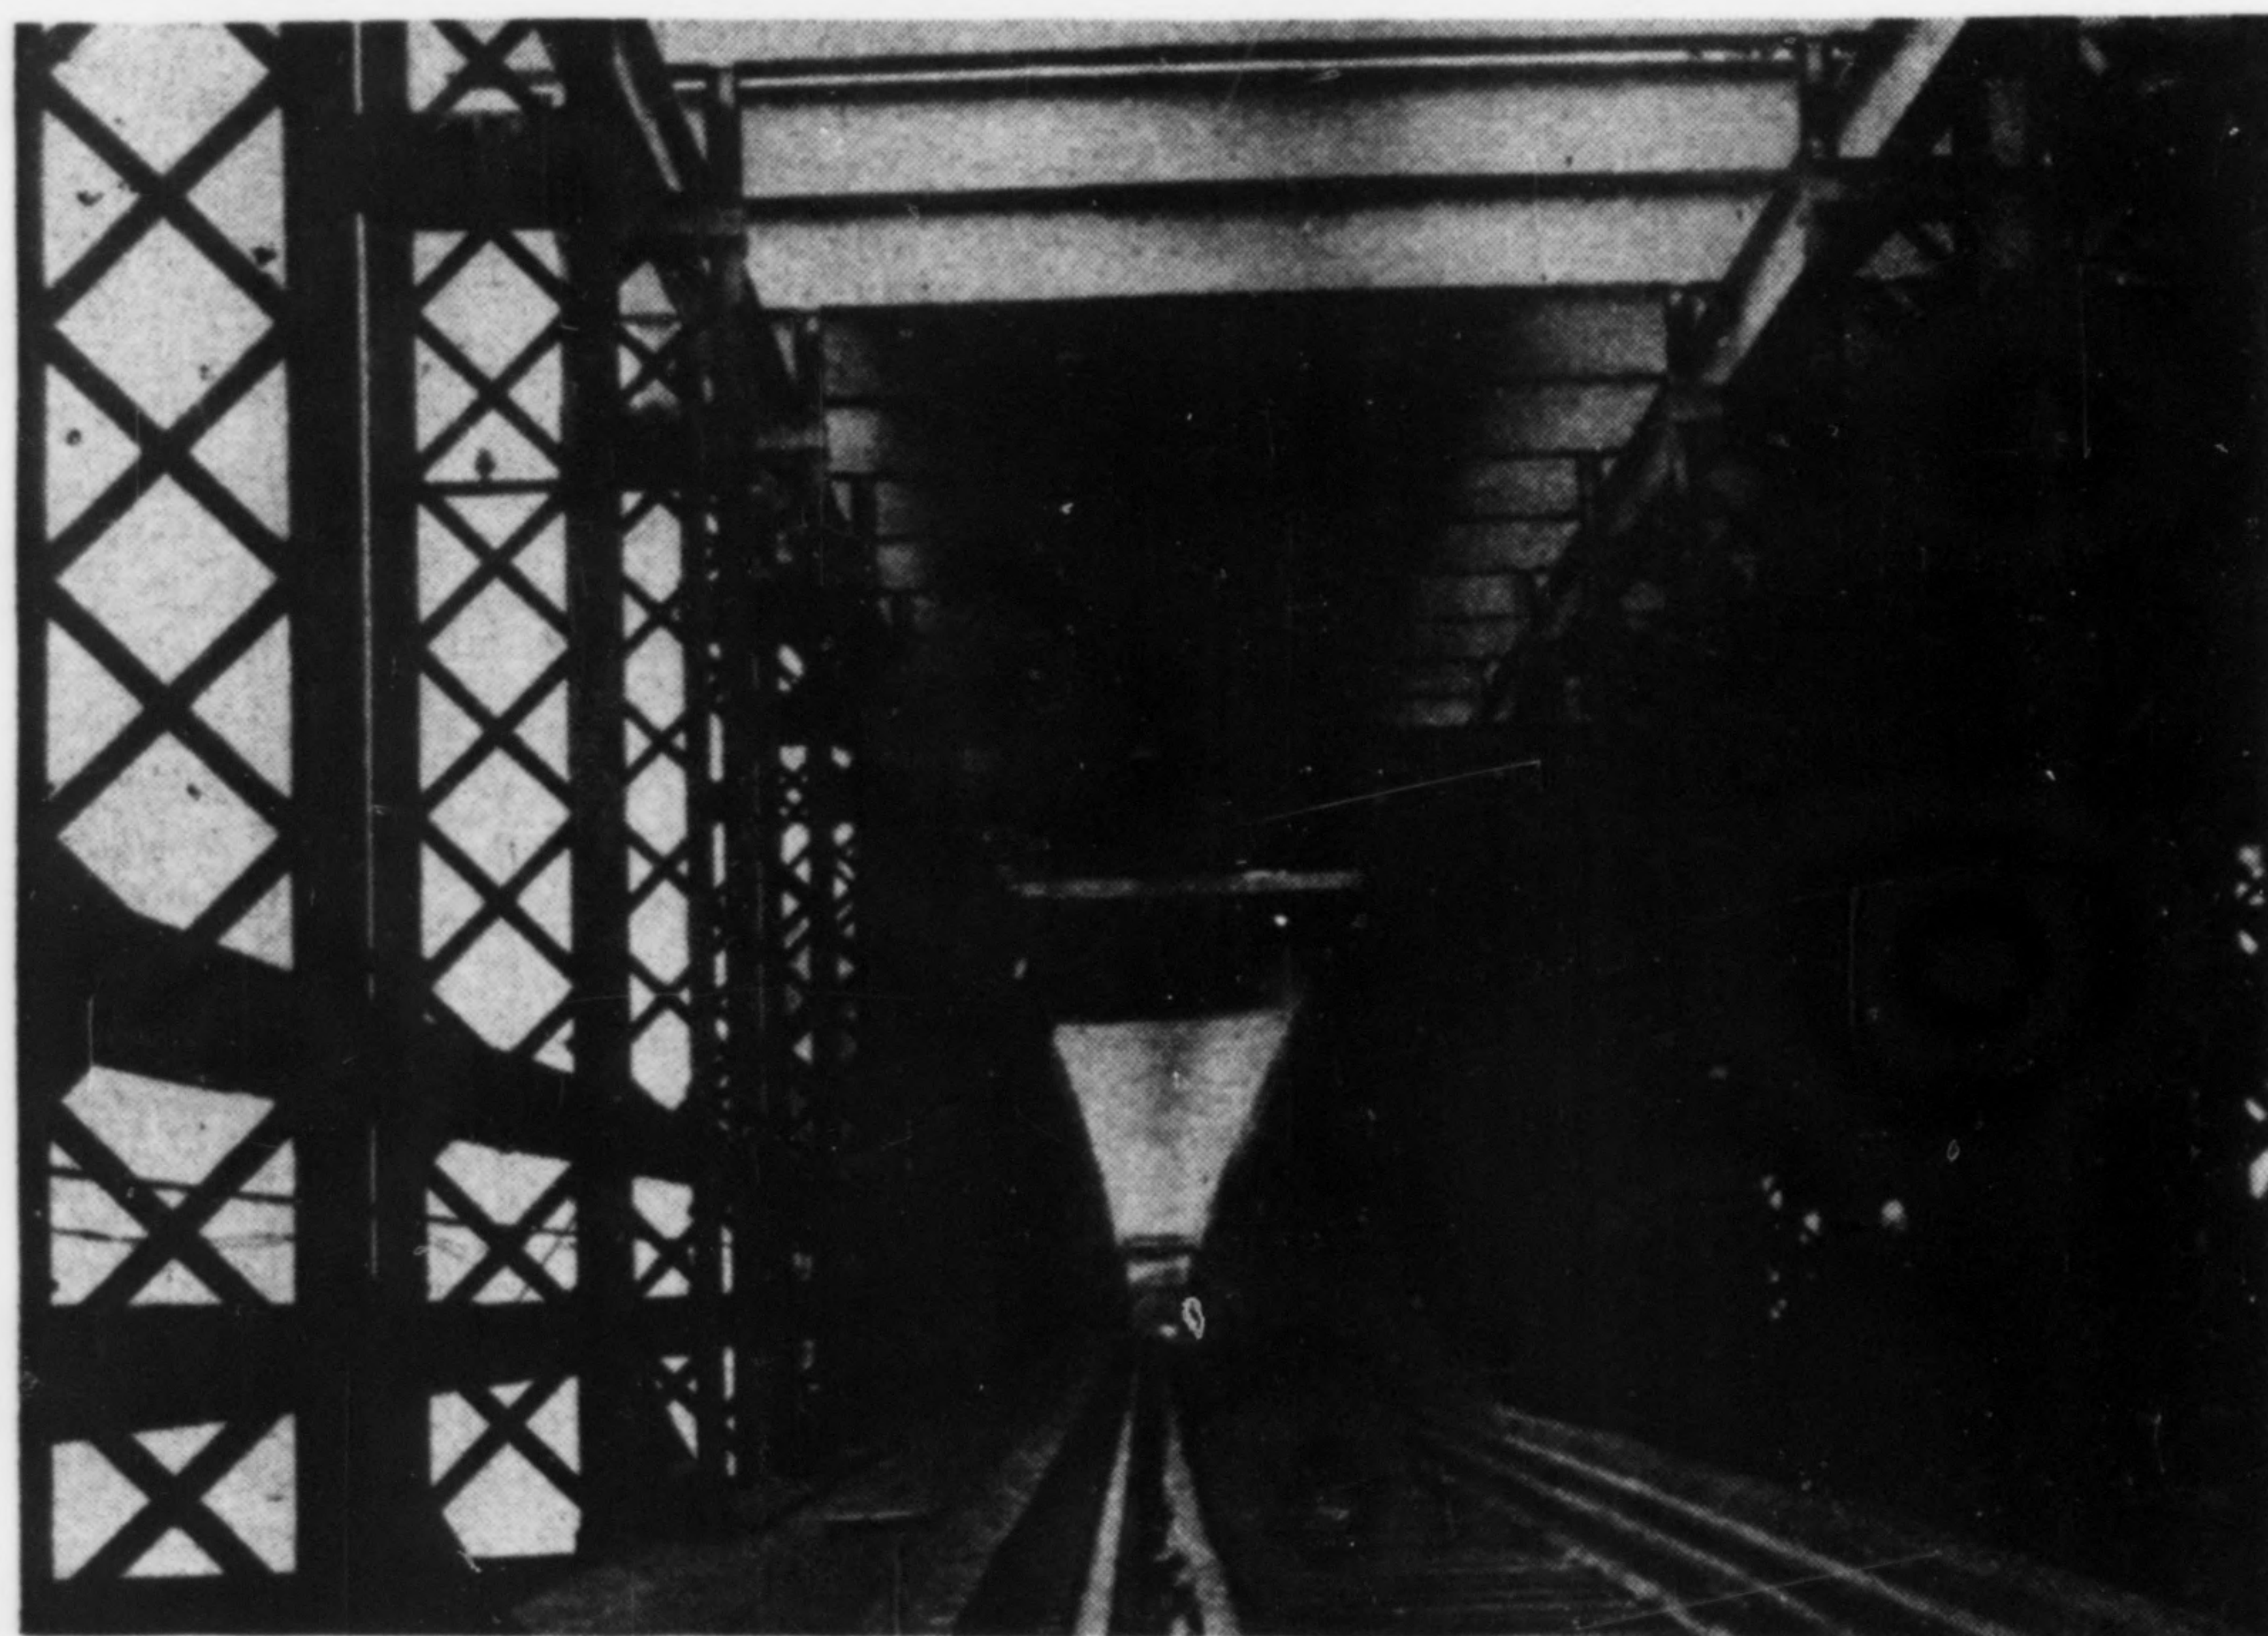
Floor system and supporting columns as viewed from lower deck. Increased clearance is gained above the railroad tracks on the lower deck by eliminating the old lateral bracing below the roadway floor system. The old bracing is shown in Fig. 2 on the preceding page.
